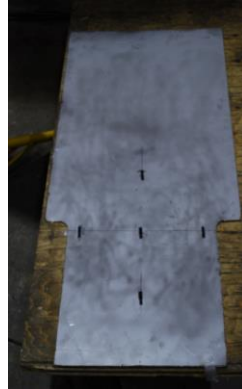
URM Wall Retrofitted with Steel Sheet Anchors
